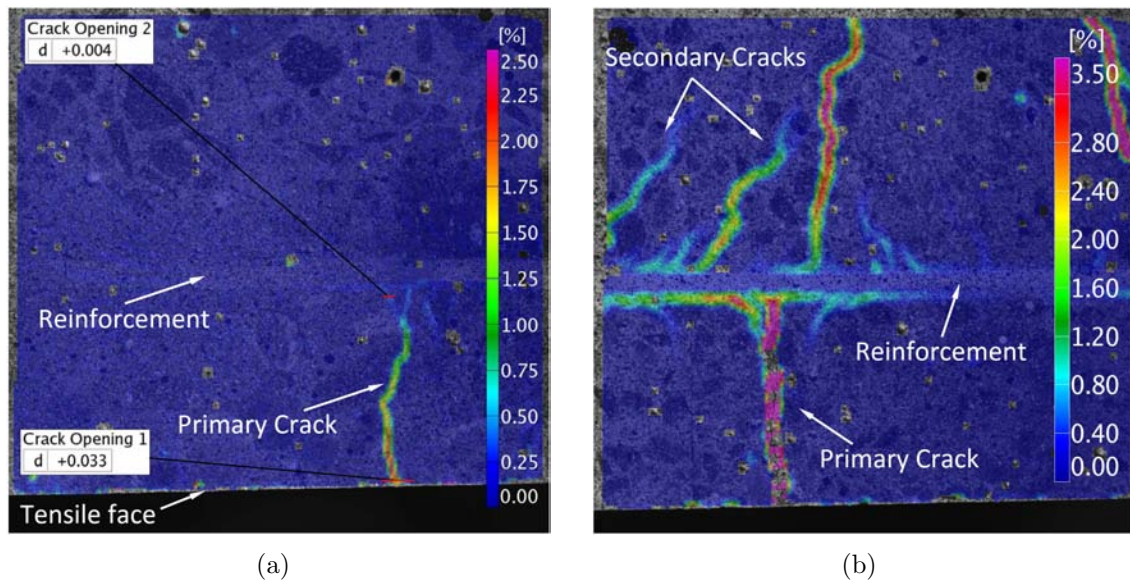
Photogrammetric assessment of cracking in reinforced concrete beams with covering concrete removed to expose concrete-reinforcement interface. Beam loaded to (a) the estimated cracking load (13.0 kN) and (b) 35.0 kN.
